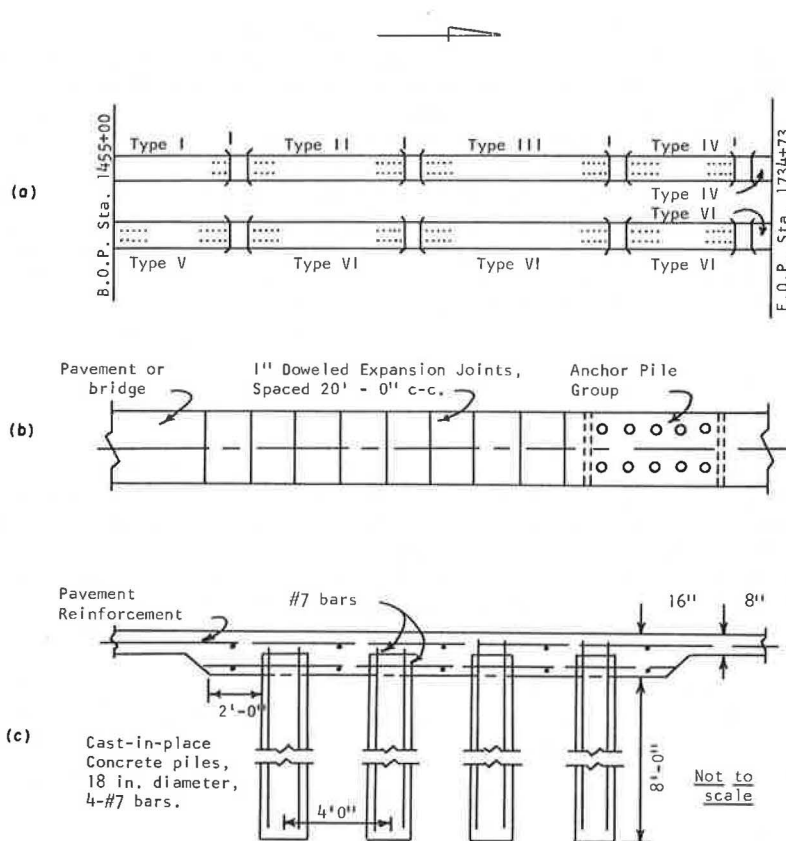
Details of Desoto County experimental project (10): (a) plan of design variables; (b) typical detail of end of pavement; and (c) typical detail of end of pile anchorage (3, 4, or 5 piles in line).
